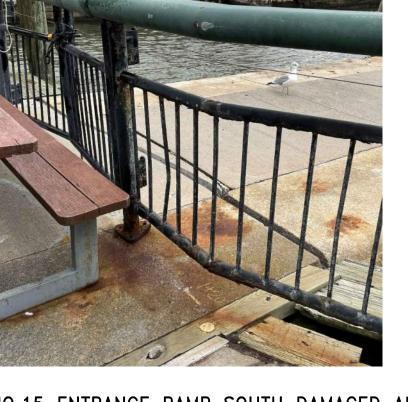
ENTRANCE RAMP SOUTH DAMAGED AND DETERIORATED HANDRAIL
